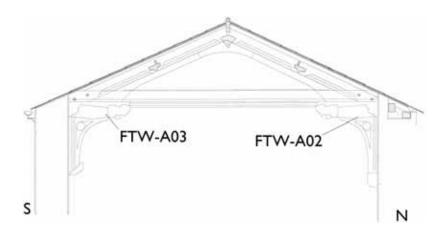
East elevation of truss 2, showing the location of samples FTW-A02 and FTW-A03 (Freeland Rees Roberts Architects)
